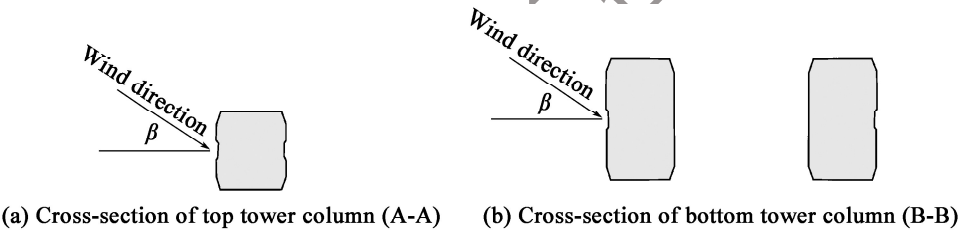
Schematic cross-sections of tower columns of Sutong Yangtze River Bridge
